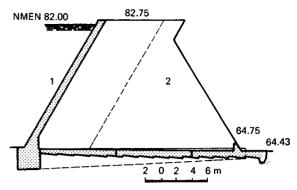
Meicende dam: cross-section, where (1) is the arch thickness, and (2) is the abutment between arches
